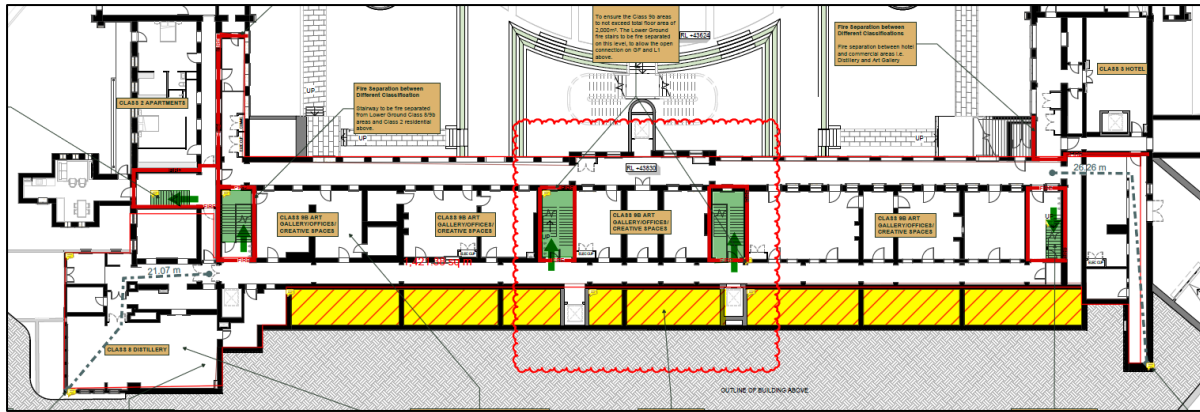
Plan showing fire compartments/location of new fire doors and walls linings
